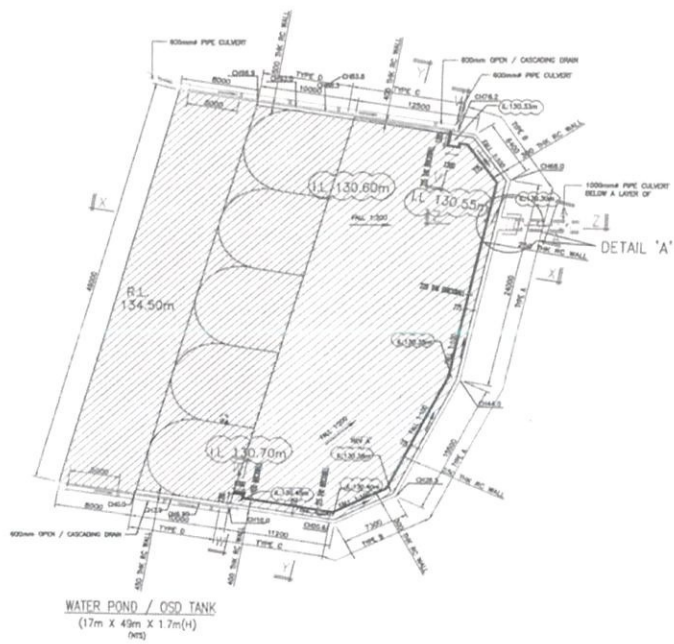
Onsite Storm water Detention Pond Layout 2
